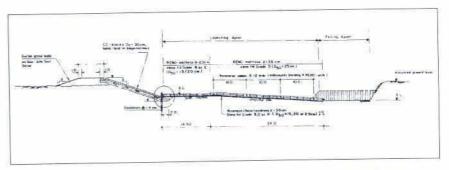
Typical cross-section of launching apron with articulating RENO*-mattress
